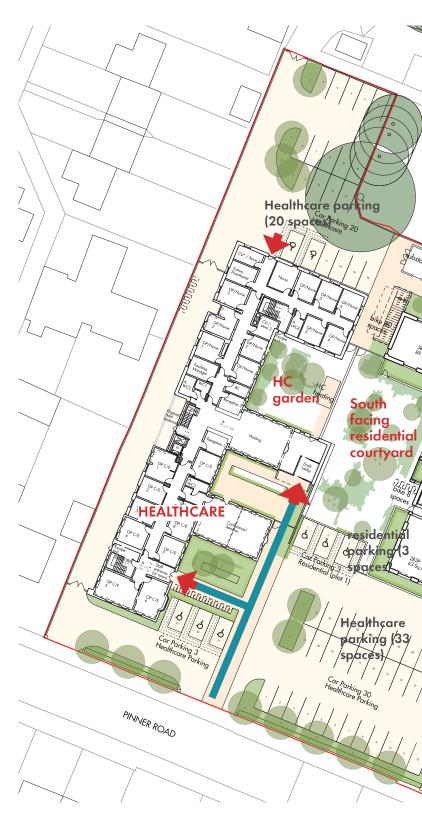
Ground Floor Plan - Scheme Pre-Application 2
